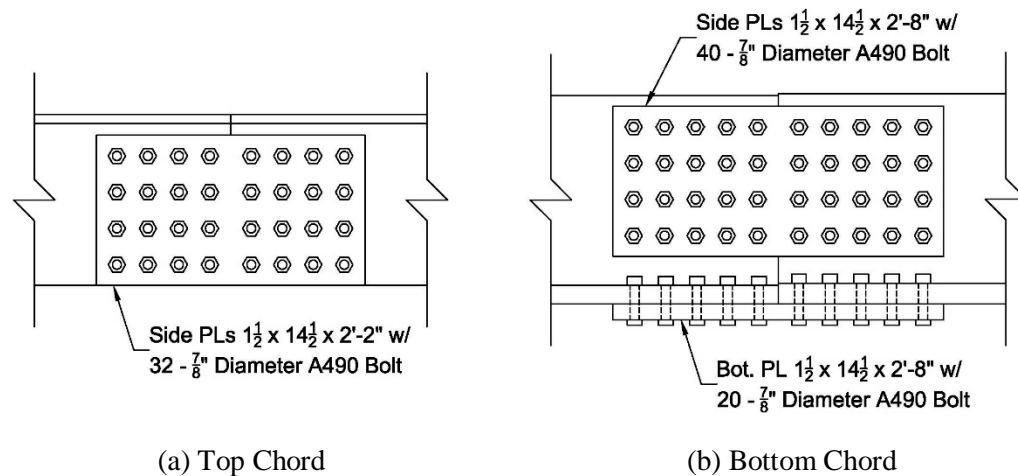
Splice Connection Details for the Two-Splices in Truss 2
